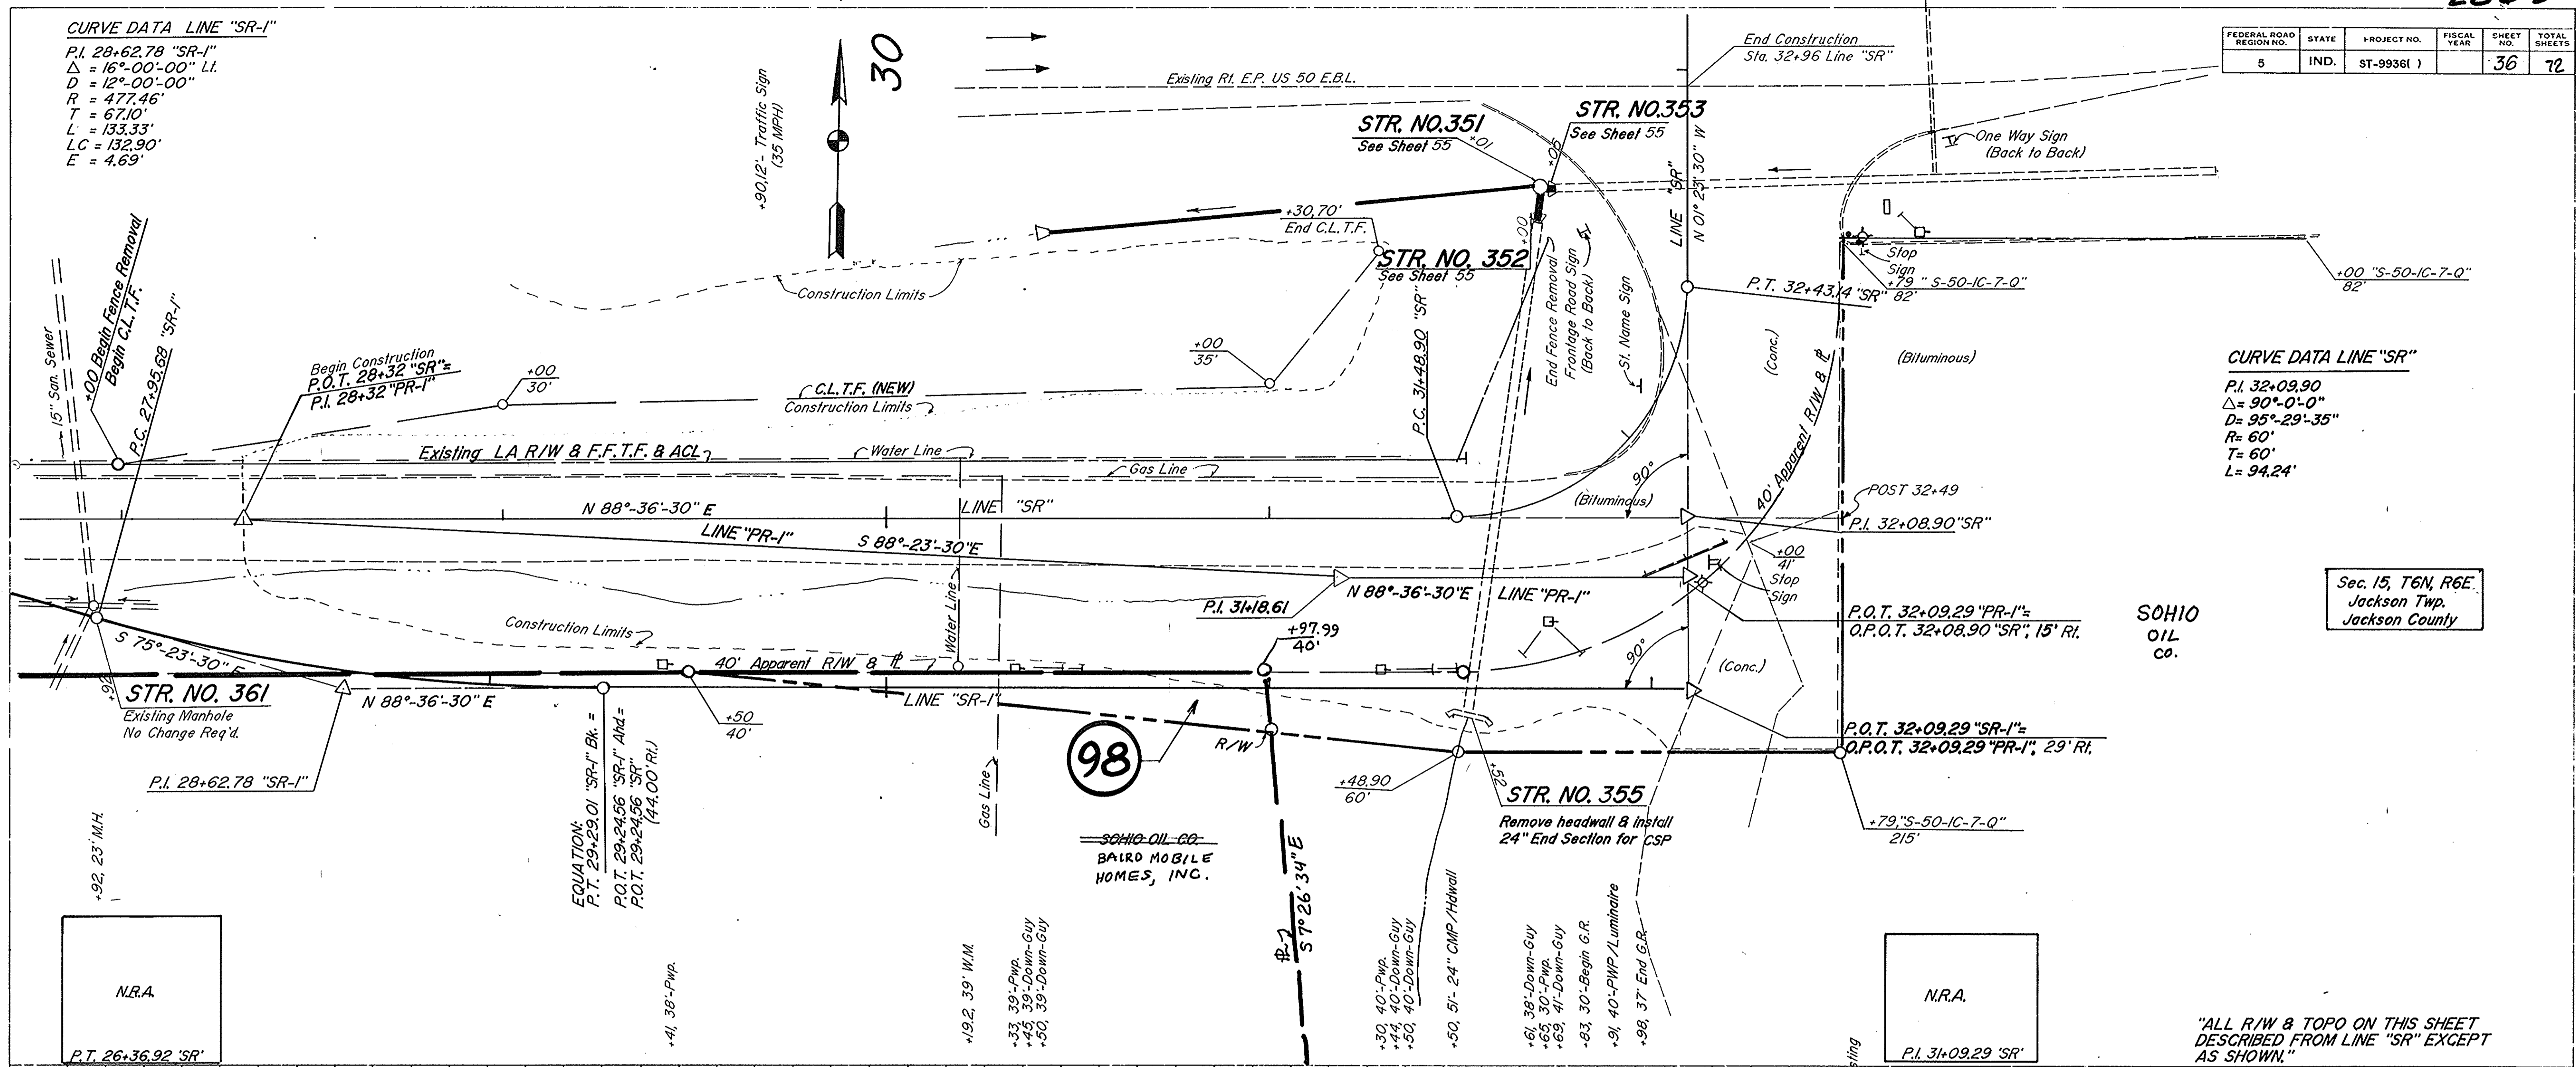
PLAN - PROFILE B. R. STANDARD
